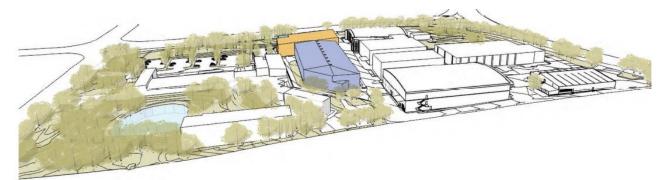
Elevated view of the site looking from the north showing the proposed Building J envelope in context of the existing MDC and TAFE buildings Source: Lahznimmo Architects, 2019
